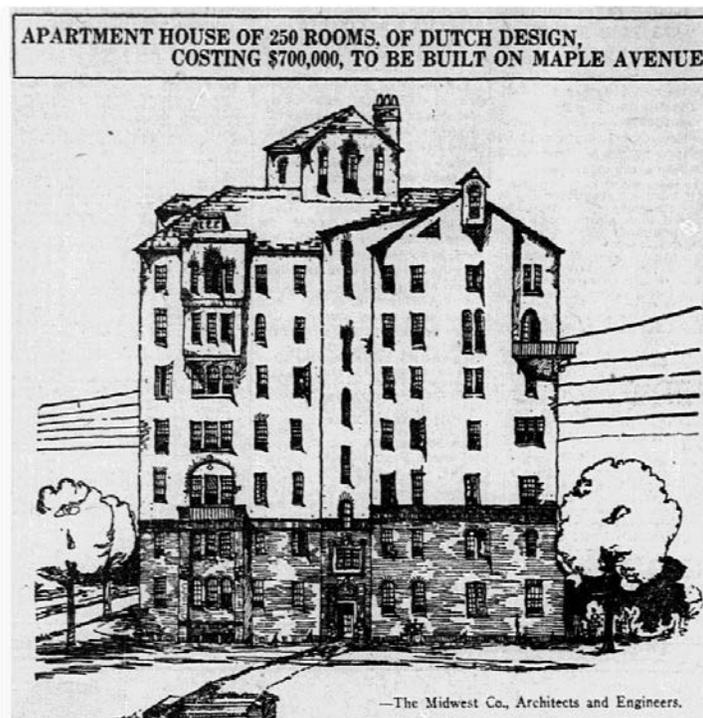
Rendering of seven-story apartment building on Maple Avenue designed by The Midwest Company (*Dallas Morning News*, 28 October 1924:1).
